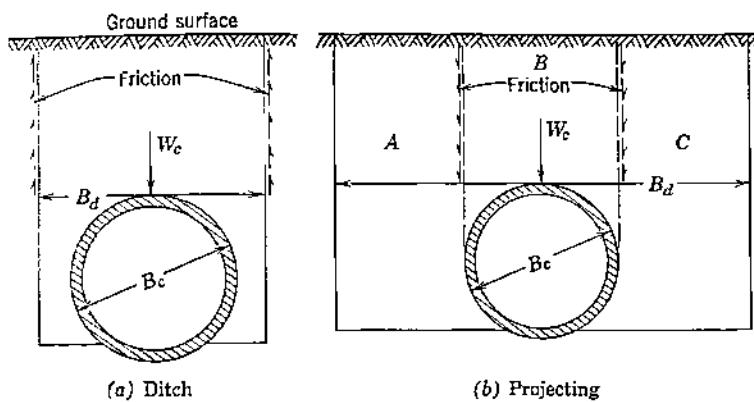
Ditch- and projecting-type conduits. (Redrawn from Van Schilfgaarde and others.¹²)
